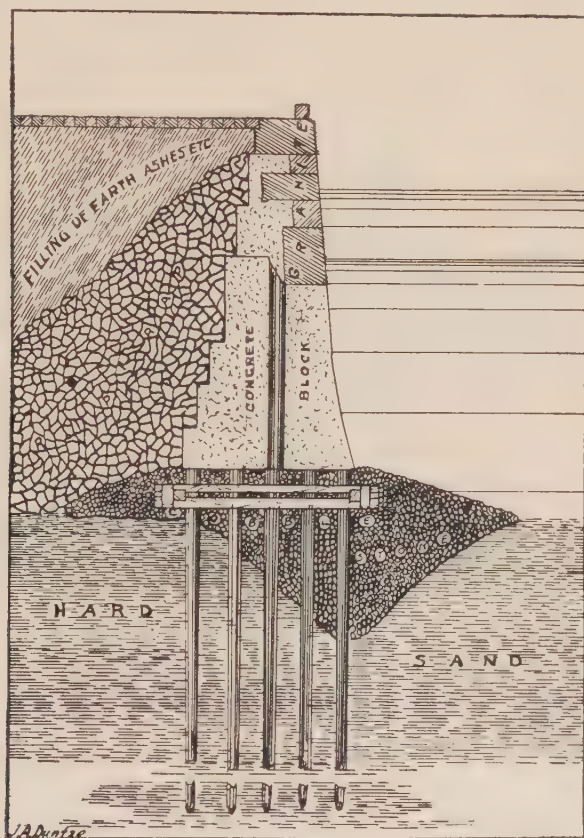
SECTION OF BULKHEAD WALL FOR HARD SAND FOUNDATION, NEW YORK, N. Y.
